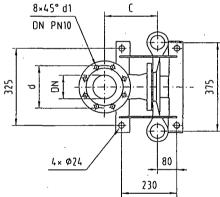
DN 80 and DN 80/100 guide rail system installation dimensions. The variable dimensions are given in table 5.3.
